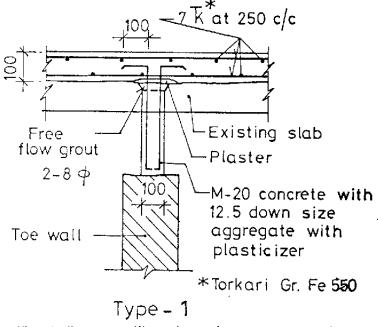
Concrete piling above the toe wall all along the periphery of the floor of the tanks.
